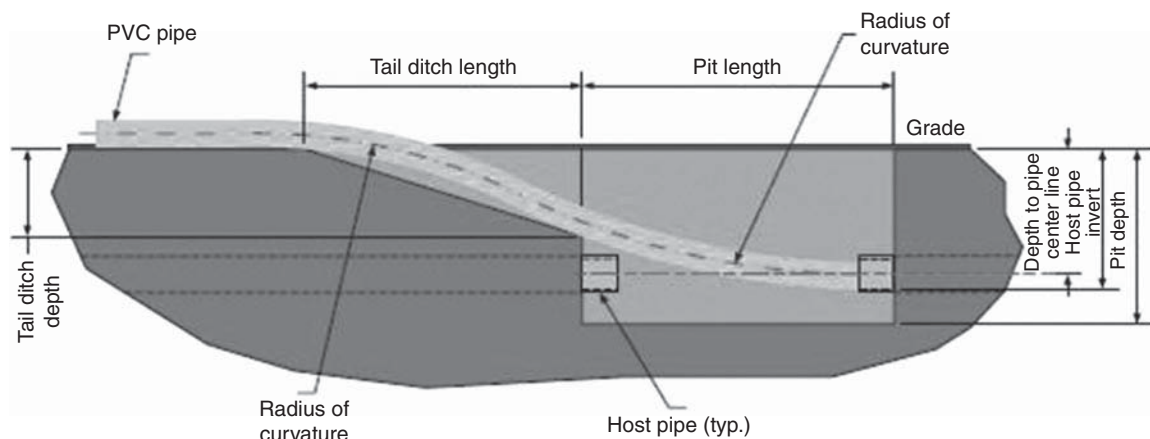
Typical installation pit for continuous sliplined PVC pipe.
